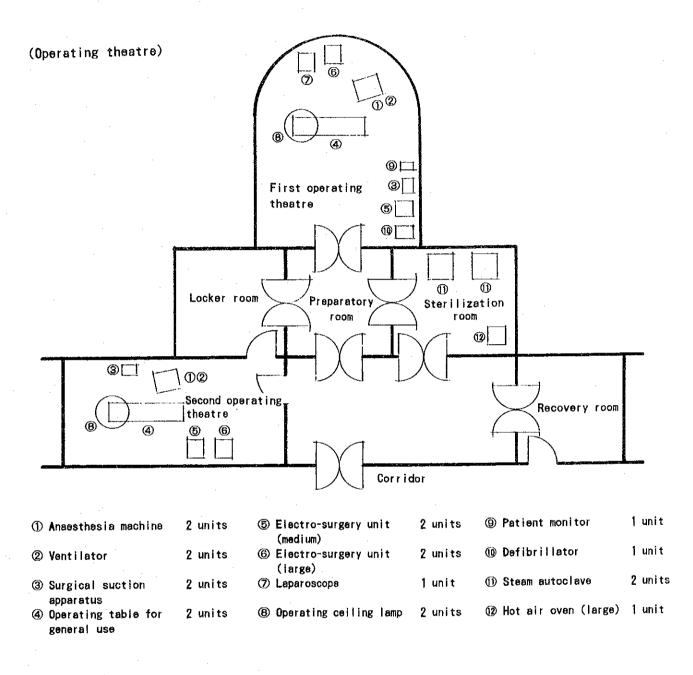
(3) Layout Plan of Major Equipment in Qena Hospital (2)
